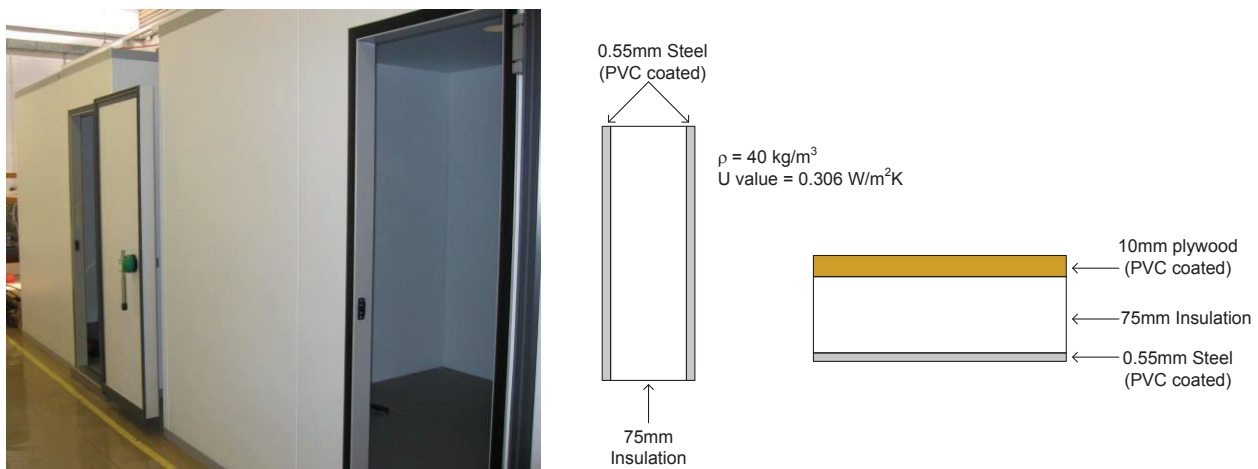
External view of test chambers (left) & schematic showing construction of walls, ceilings and floor (right)
